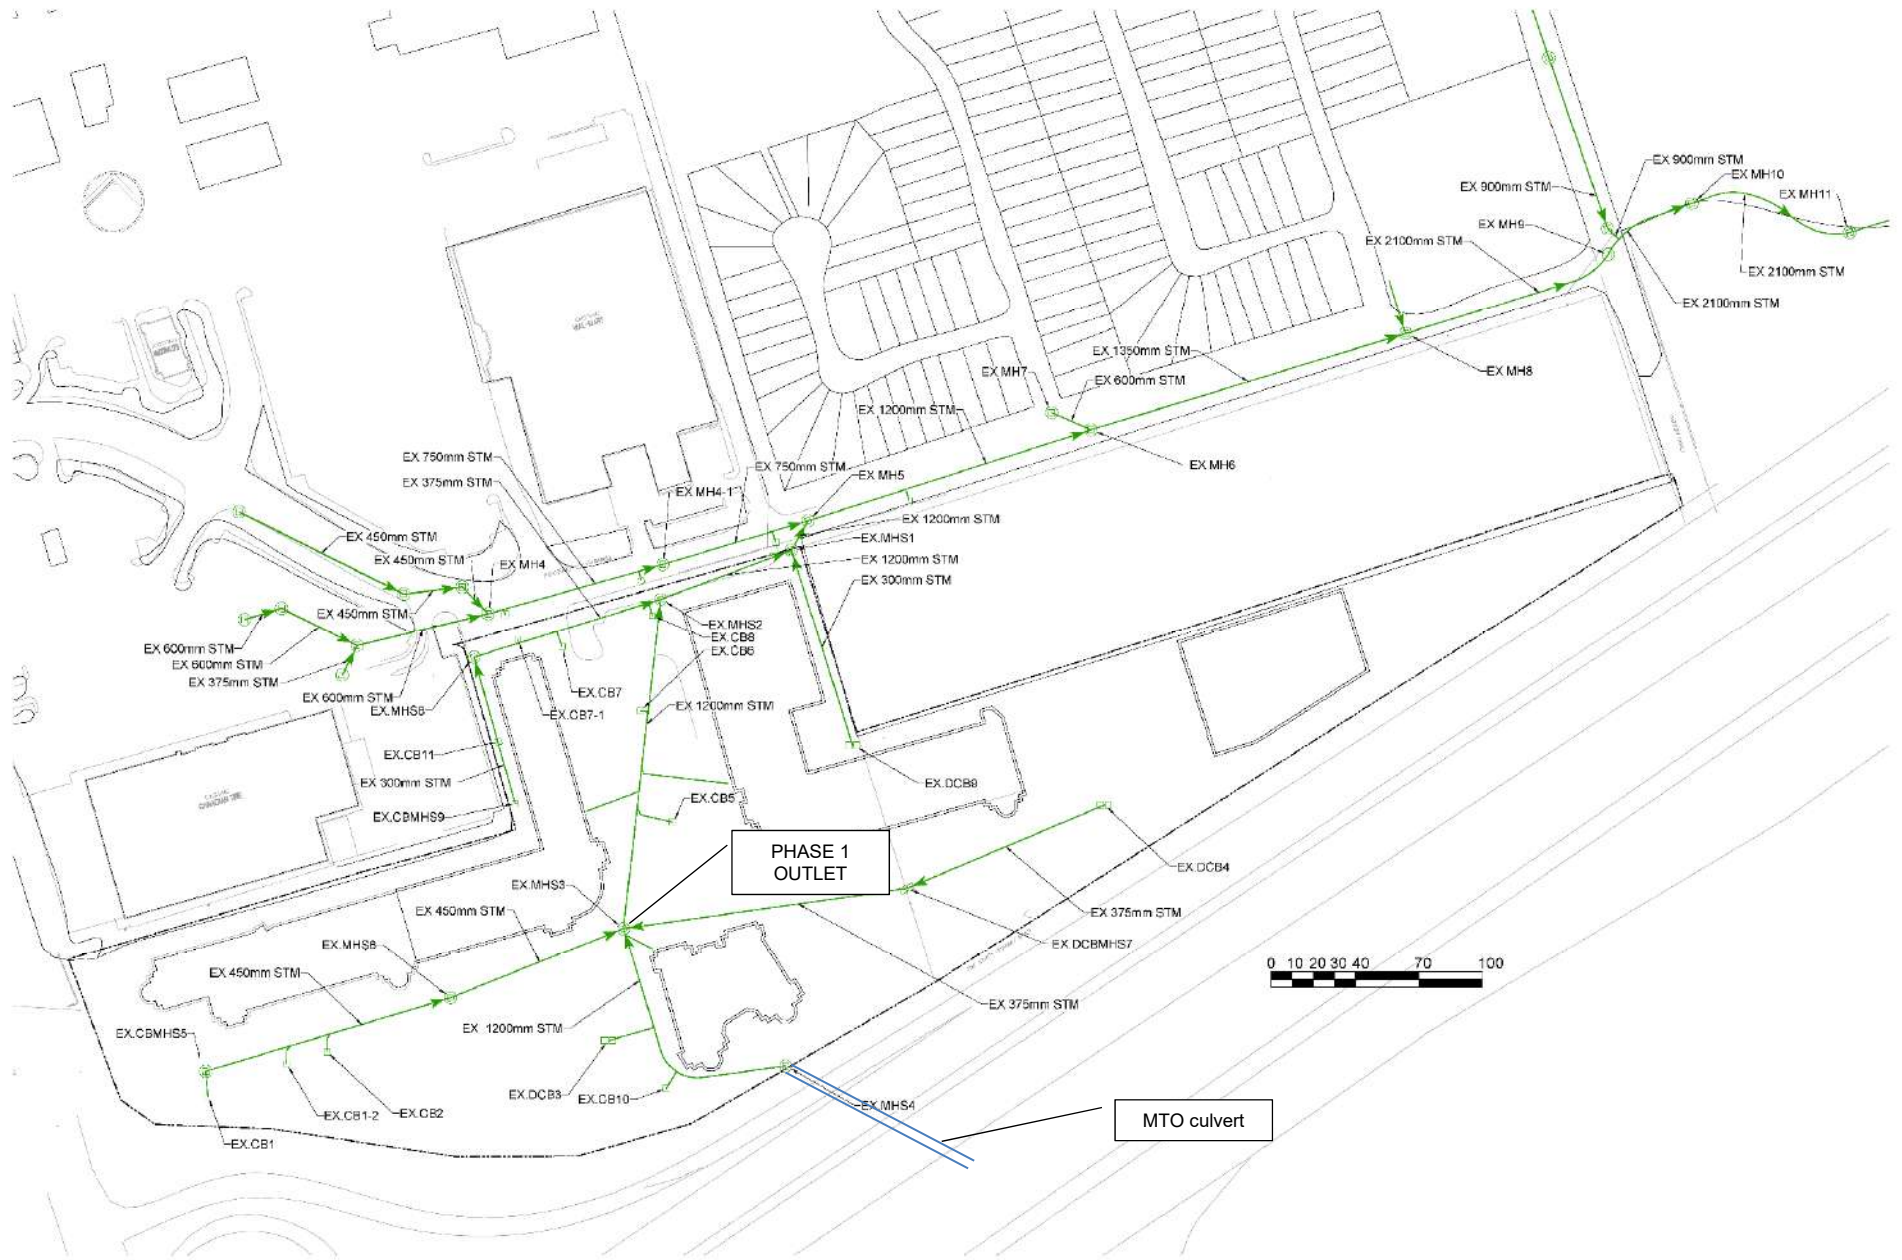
City layout of existing Storm sewers and Site sewers
